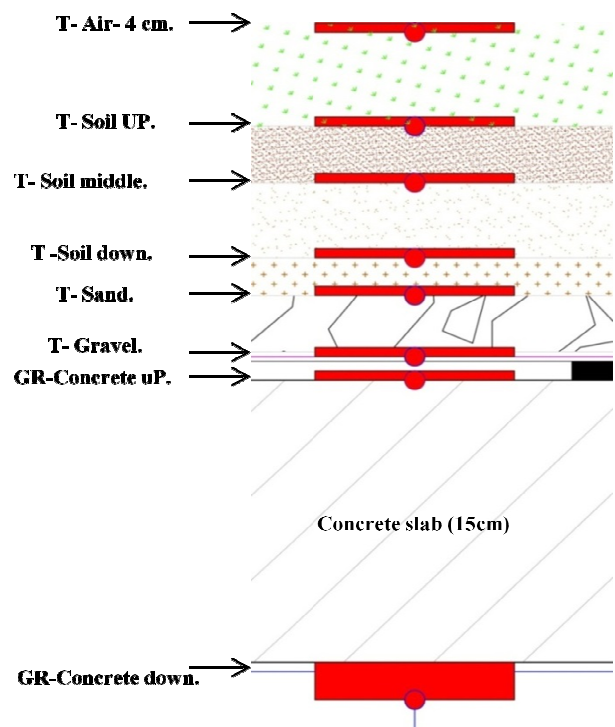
The vertical section shows the sensors' places in the extensive green roof system.
